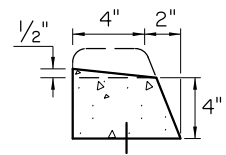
' CURB & GUTTER (BARRIER)
